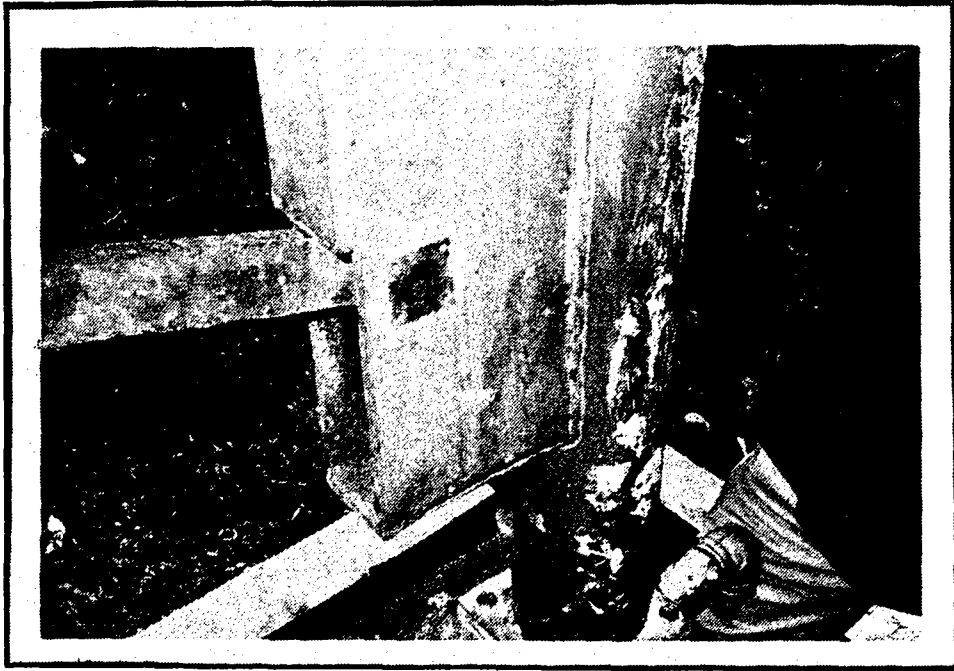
Example of failure of ball bearing due to water entering under the cover plate.
